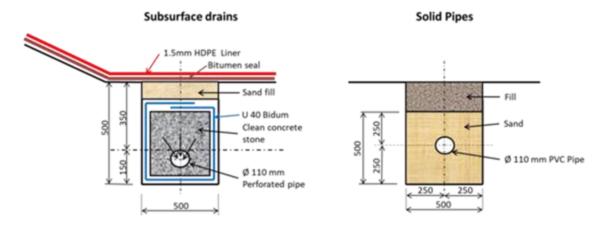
Layout of the drains and pipes 8.3.1 Energy Use
